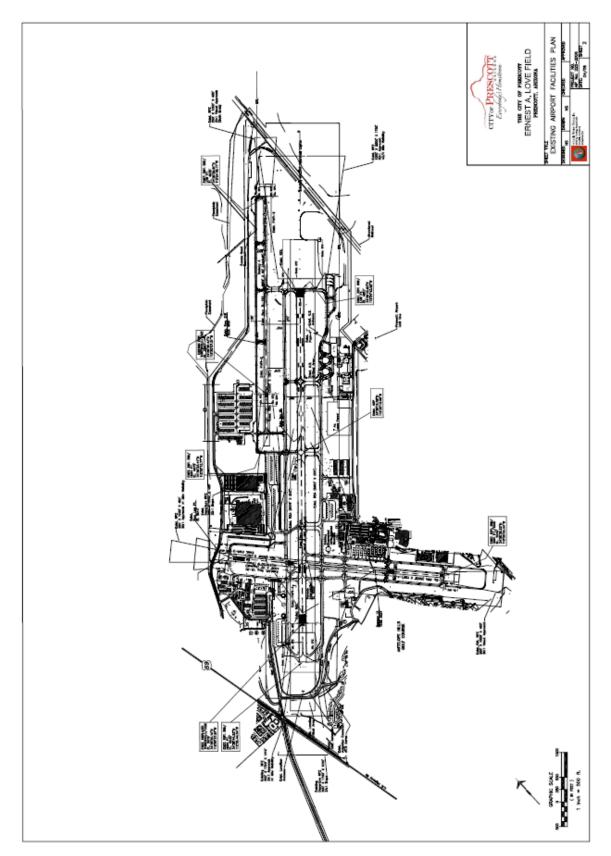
EXISTING AIRPORT LAYOUT
